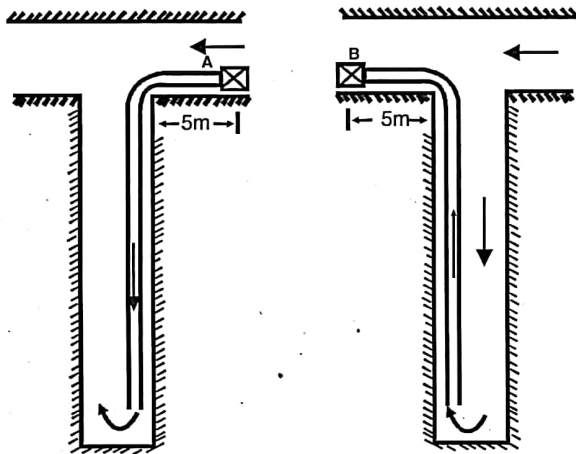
Installation of auxiliary fan, A – a forcing fan; B – an exhaust fan.
